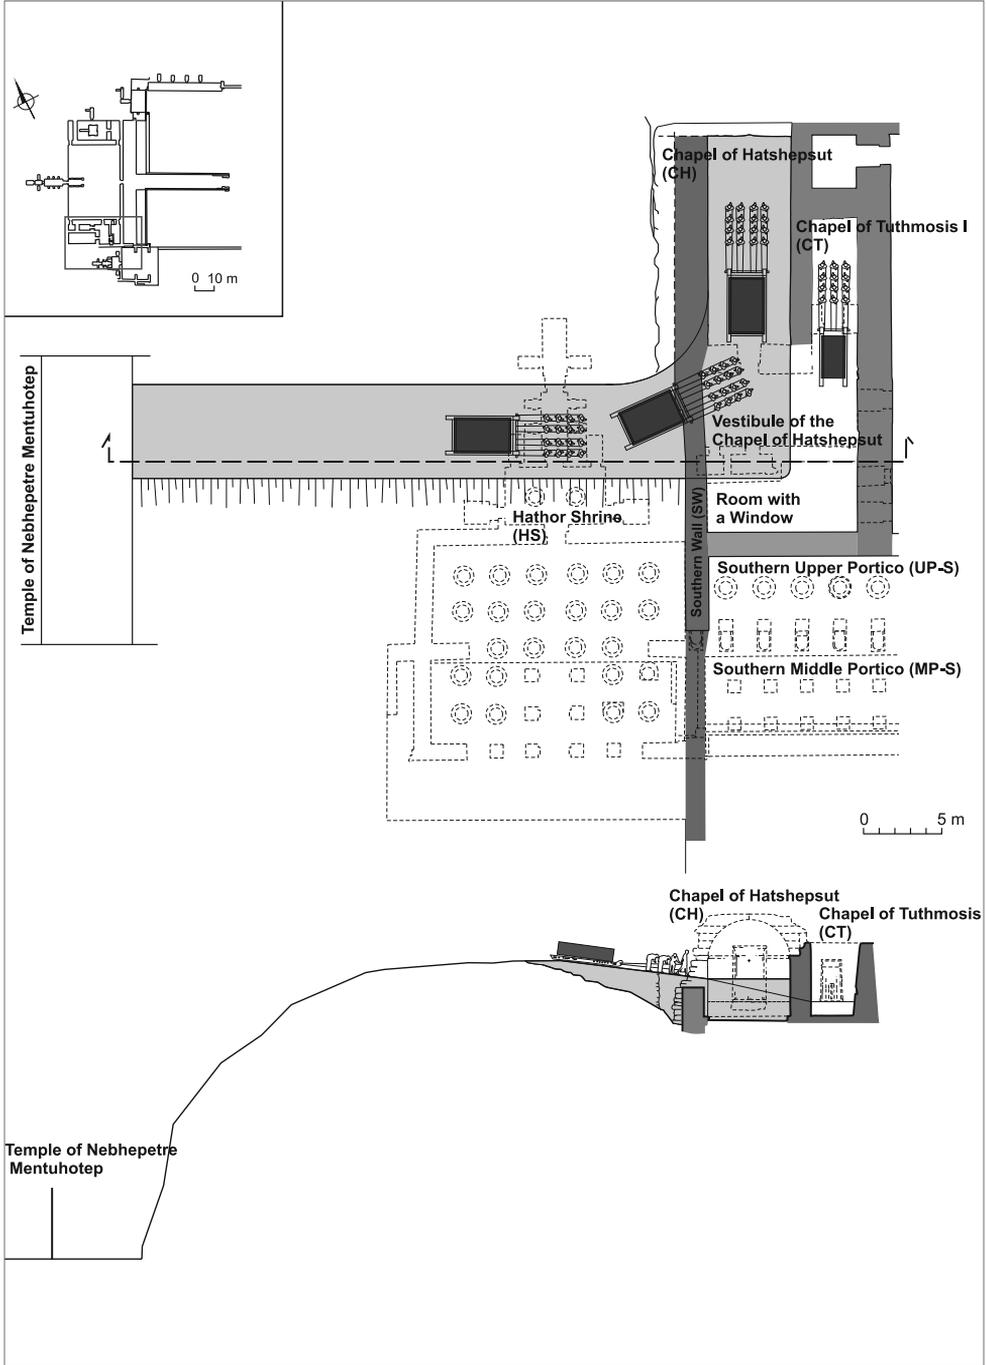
Option 1. Plan and cross-section demonstrating the possibilities of transporting slabs from a southern direction (Drawing T. Dziedzic)
